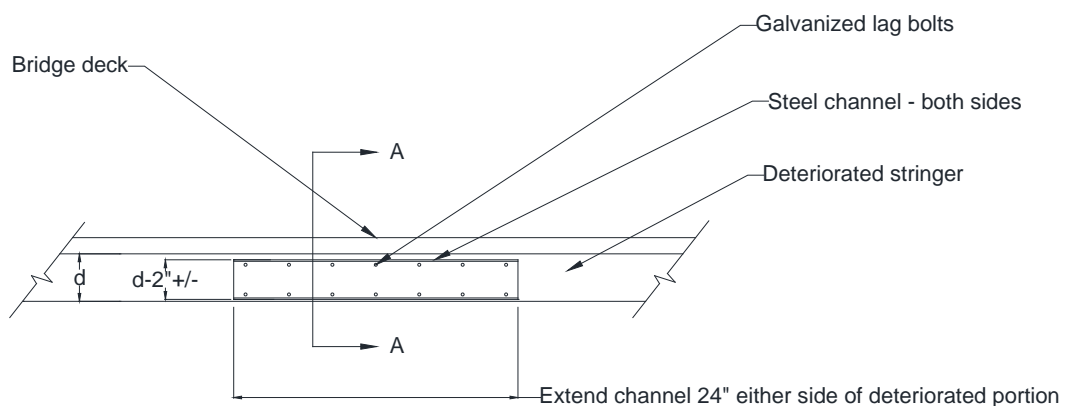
Strengthening of timber girder or stringer – flexural reinforcement, steel channel
